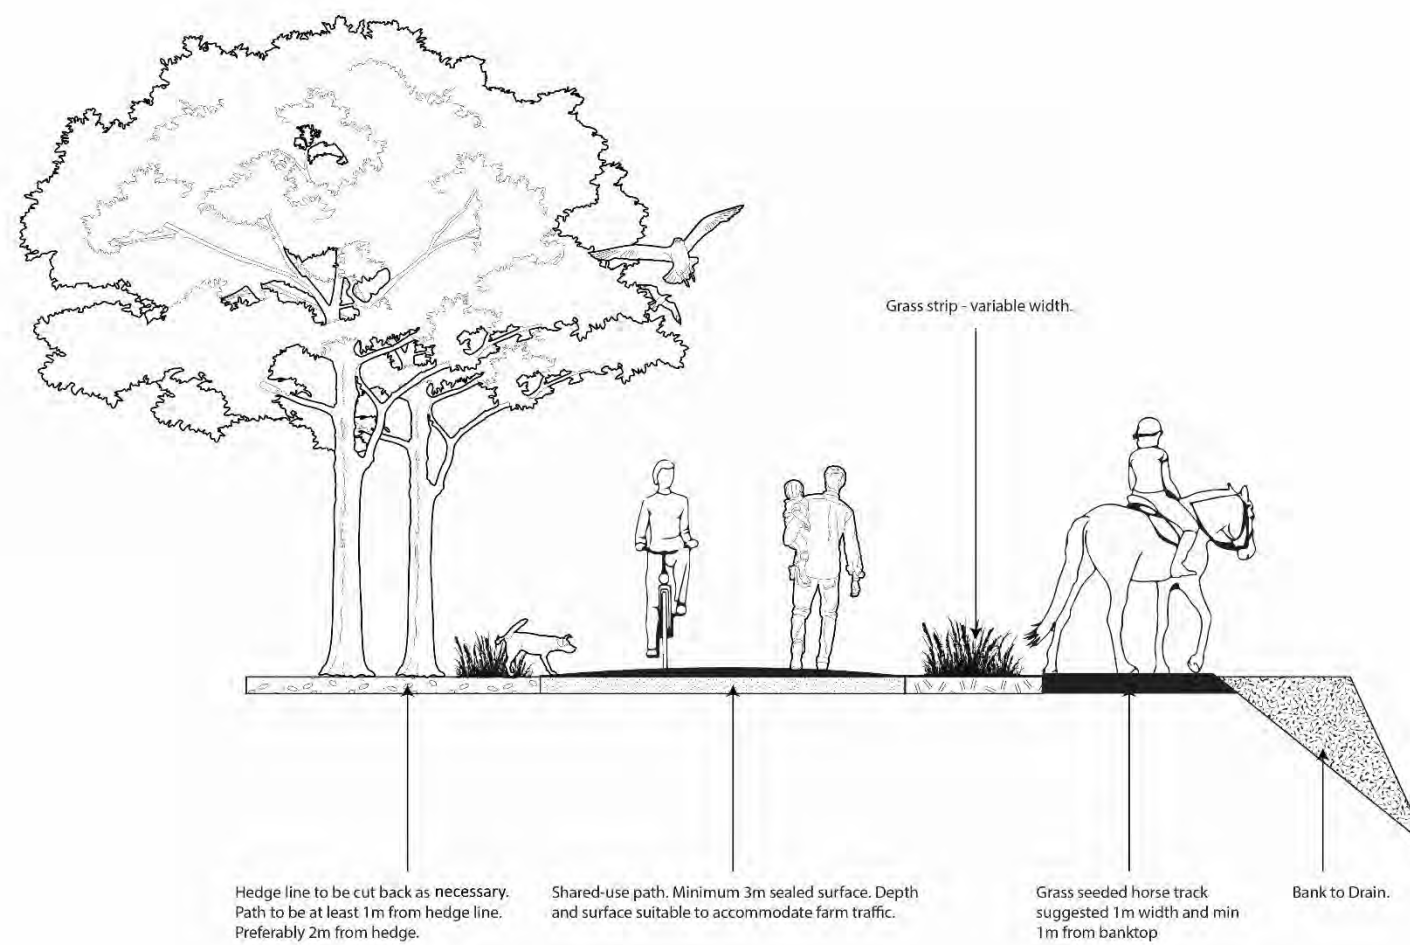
A.5.1 Cross Section showing the potential arrangement for wider byways.
